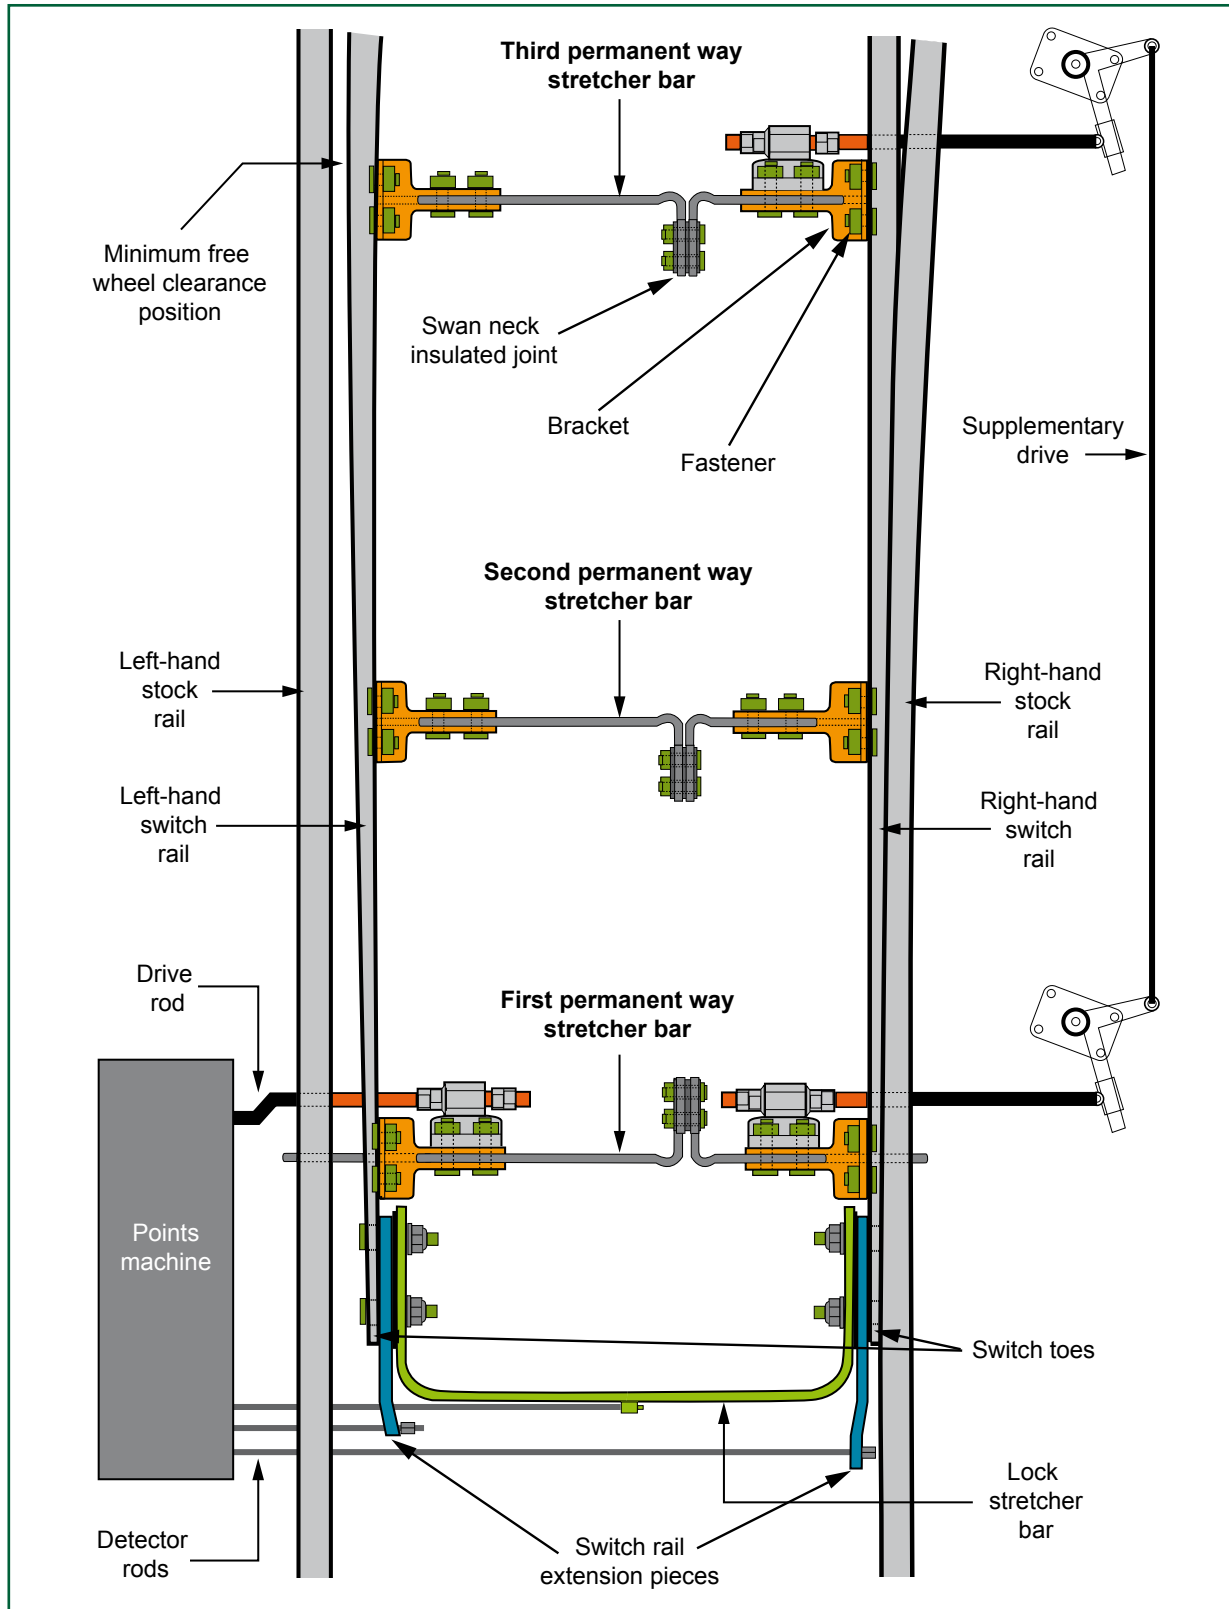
Layout of points showing switch and stock rails and stretcher bars
